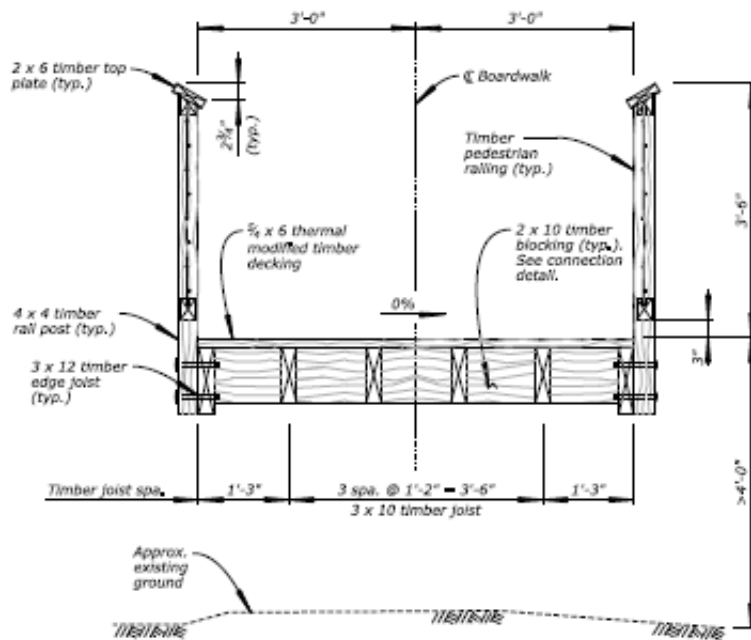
BOARDWALK CONCEPTUAL TYPICAL DECK FRAMING
